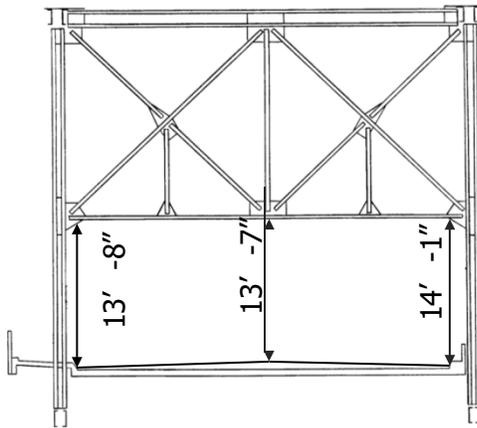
Cross-section view of a through-truss bridge showing minimum vertical clearance.
